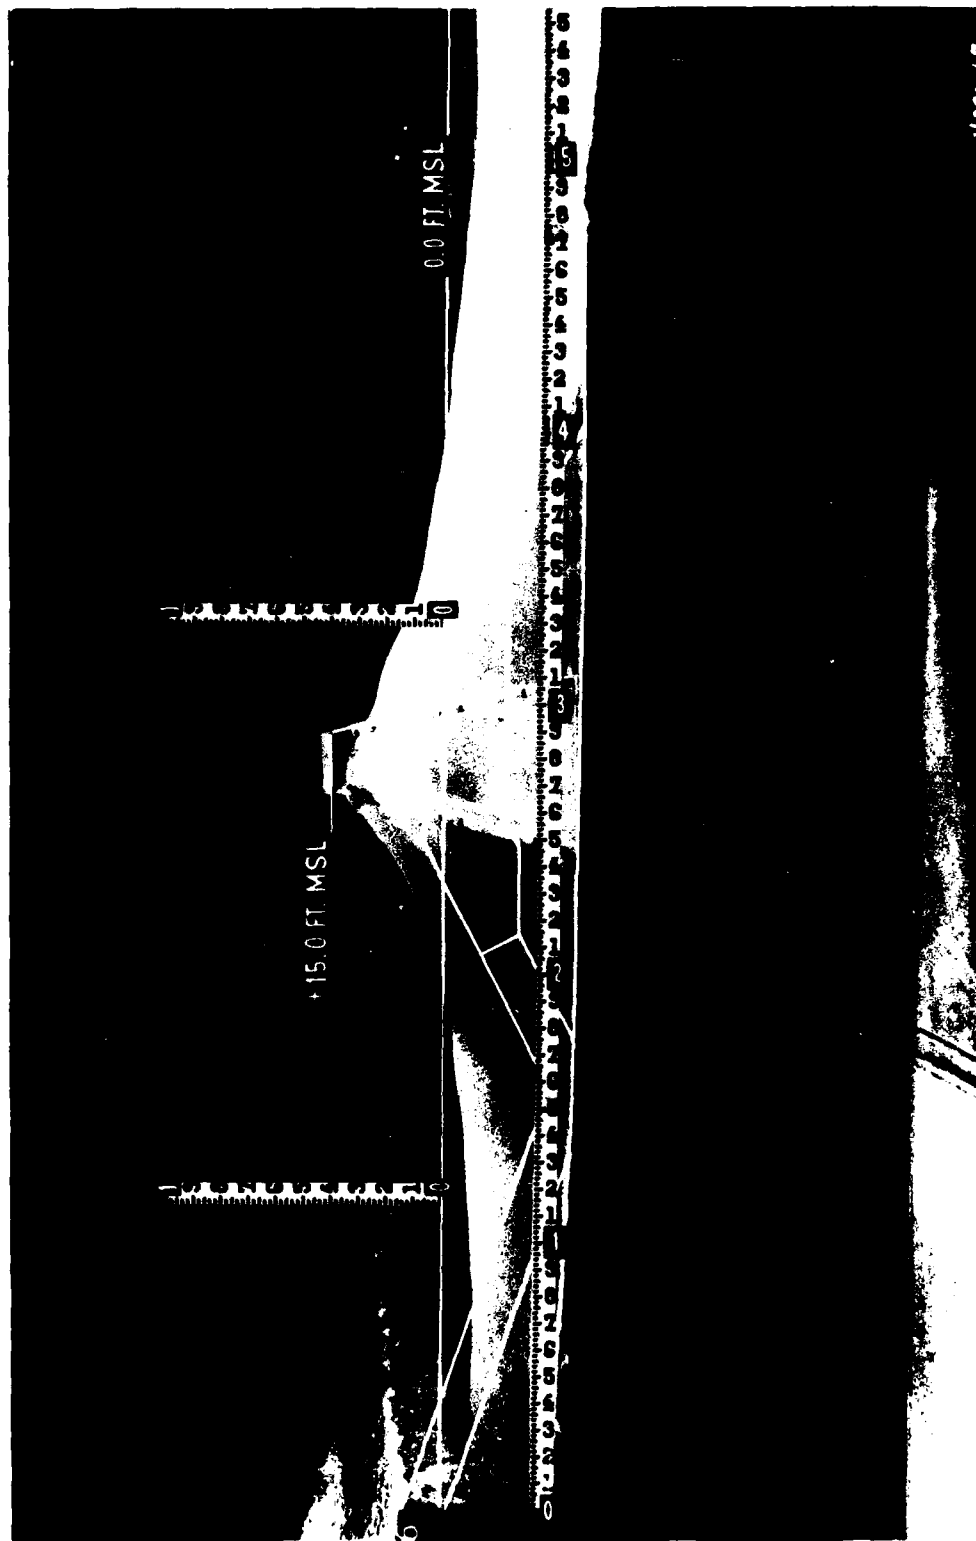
Side view of trestle on north slope, 9.0-sec, 10.0-ft wave at 0.0 swl
